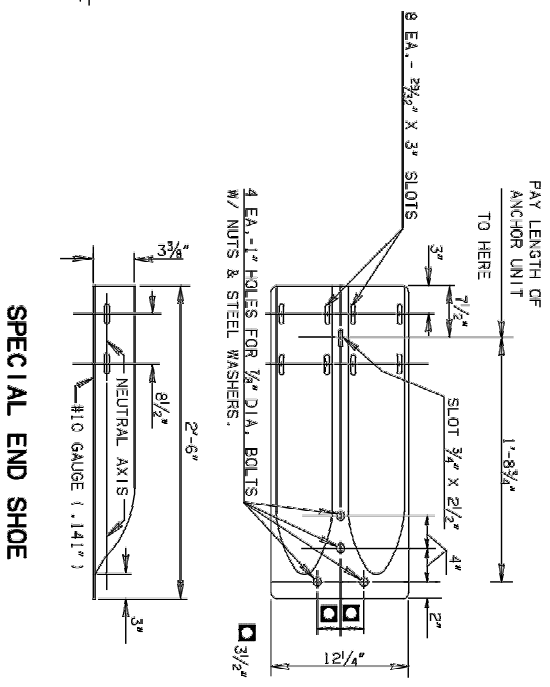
DETAIL OF SPECIAL END SHOE ON CONCRETE ANCHOR
